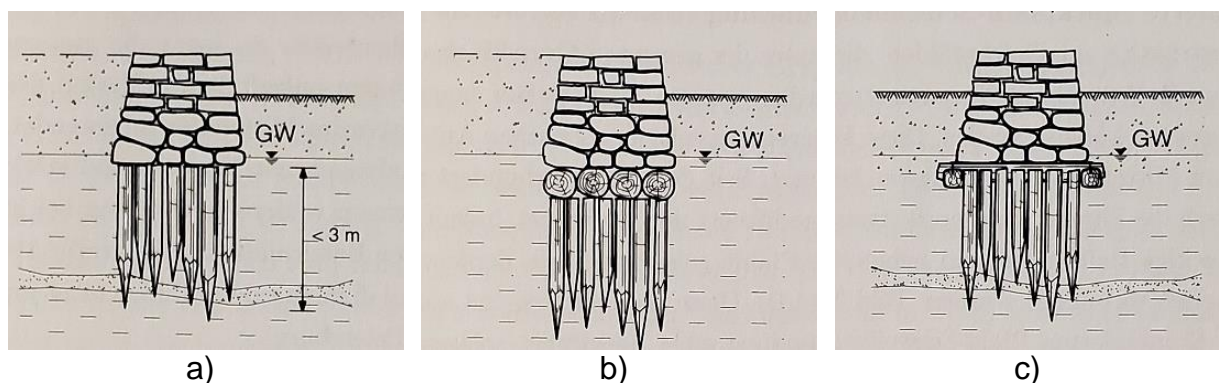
Schematic Diagrams of Wooden Compaction Pile Foundations, a) Pure wooden compaction piles underneath masonry footing, b) & c) wooden compaction piles underneath horizontal wooden piles or planking underneath the masonry footing (Jovanovic, 2002)
